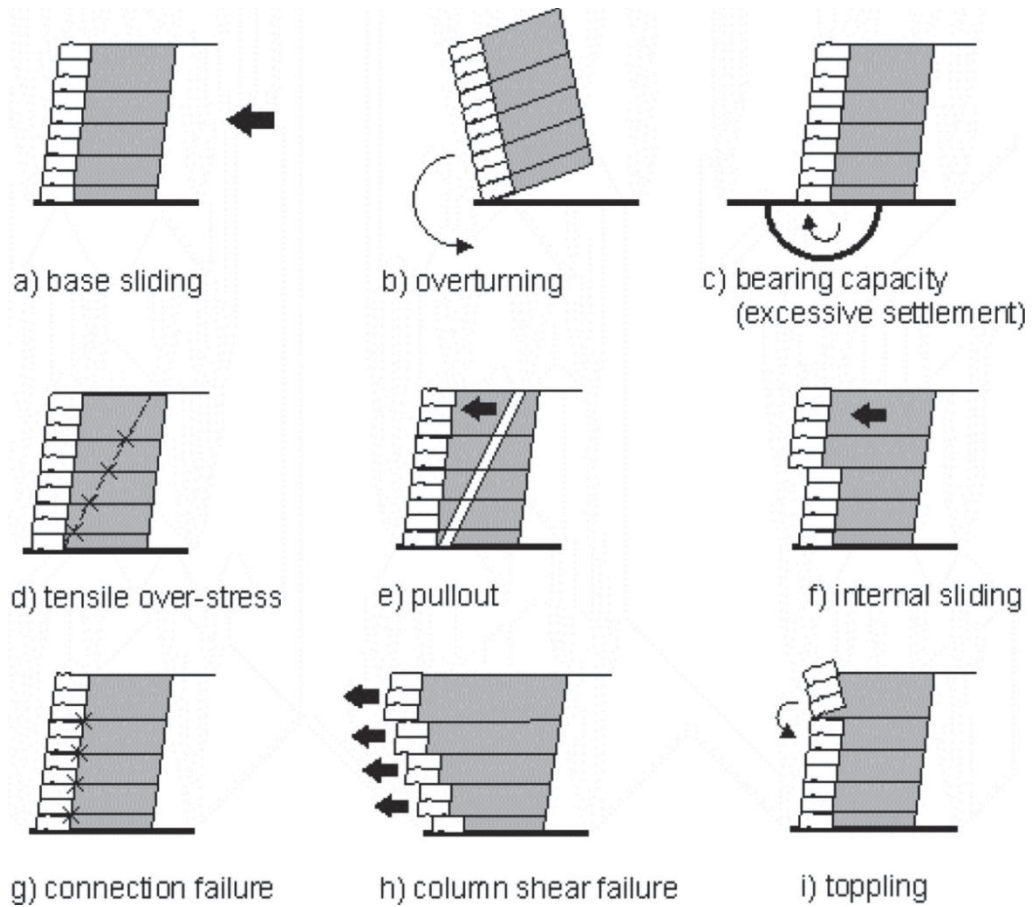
Modes of failure for reinforced soil walls (CFEM 2006)
